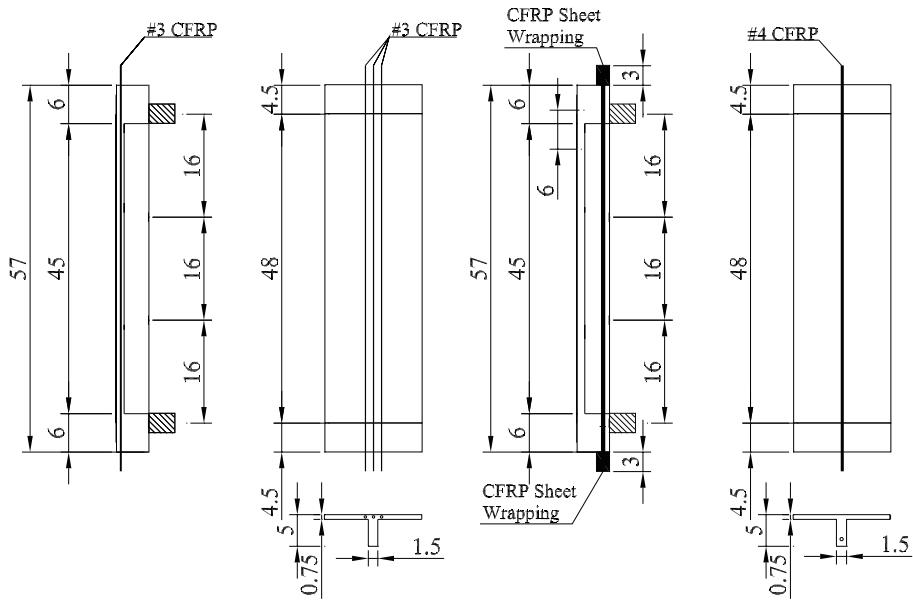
Designed CFRP reinforcing system layout (h=5' sample)
